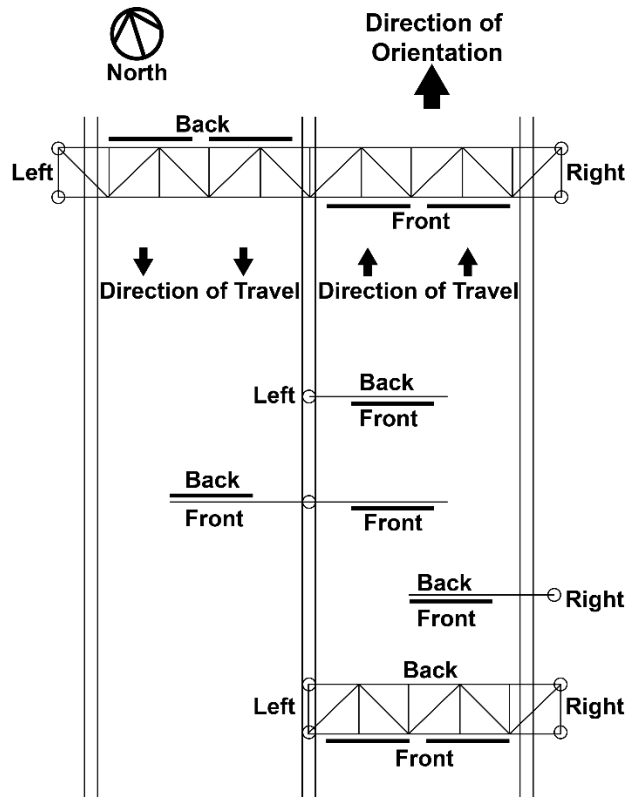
Illustration. Structure orientation examples with sign panels facing both directions of travel.
